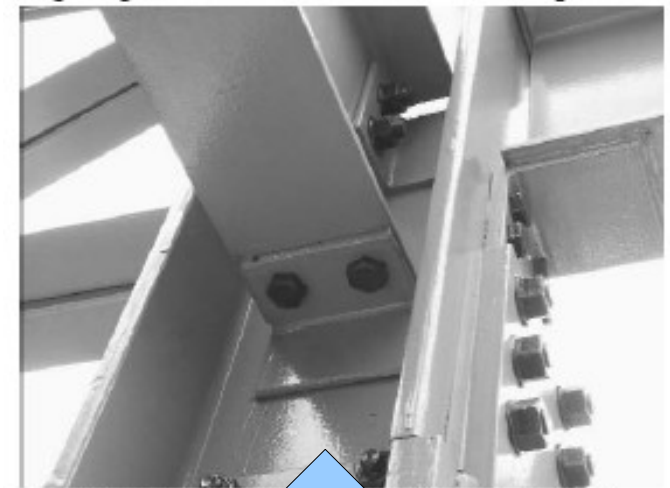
Shear Connection: Welded unstiffened seat
